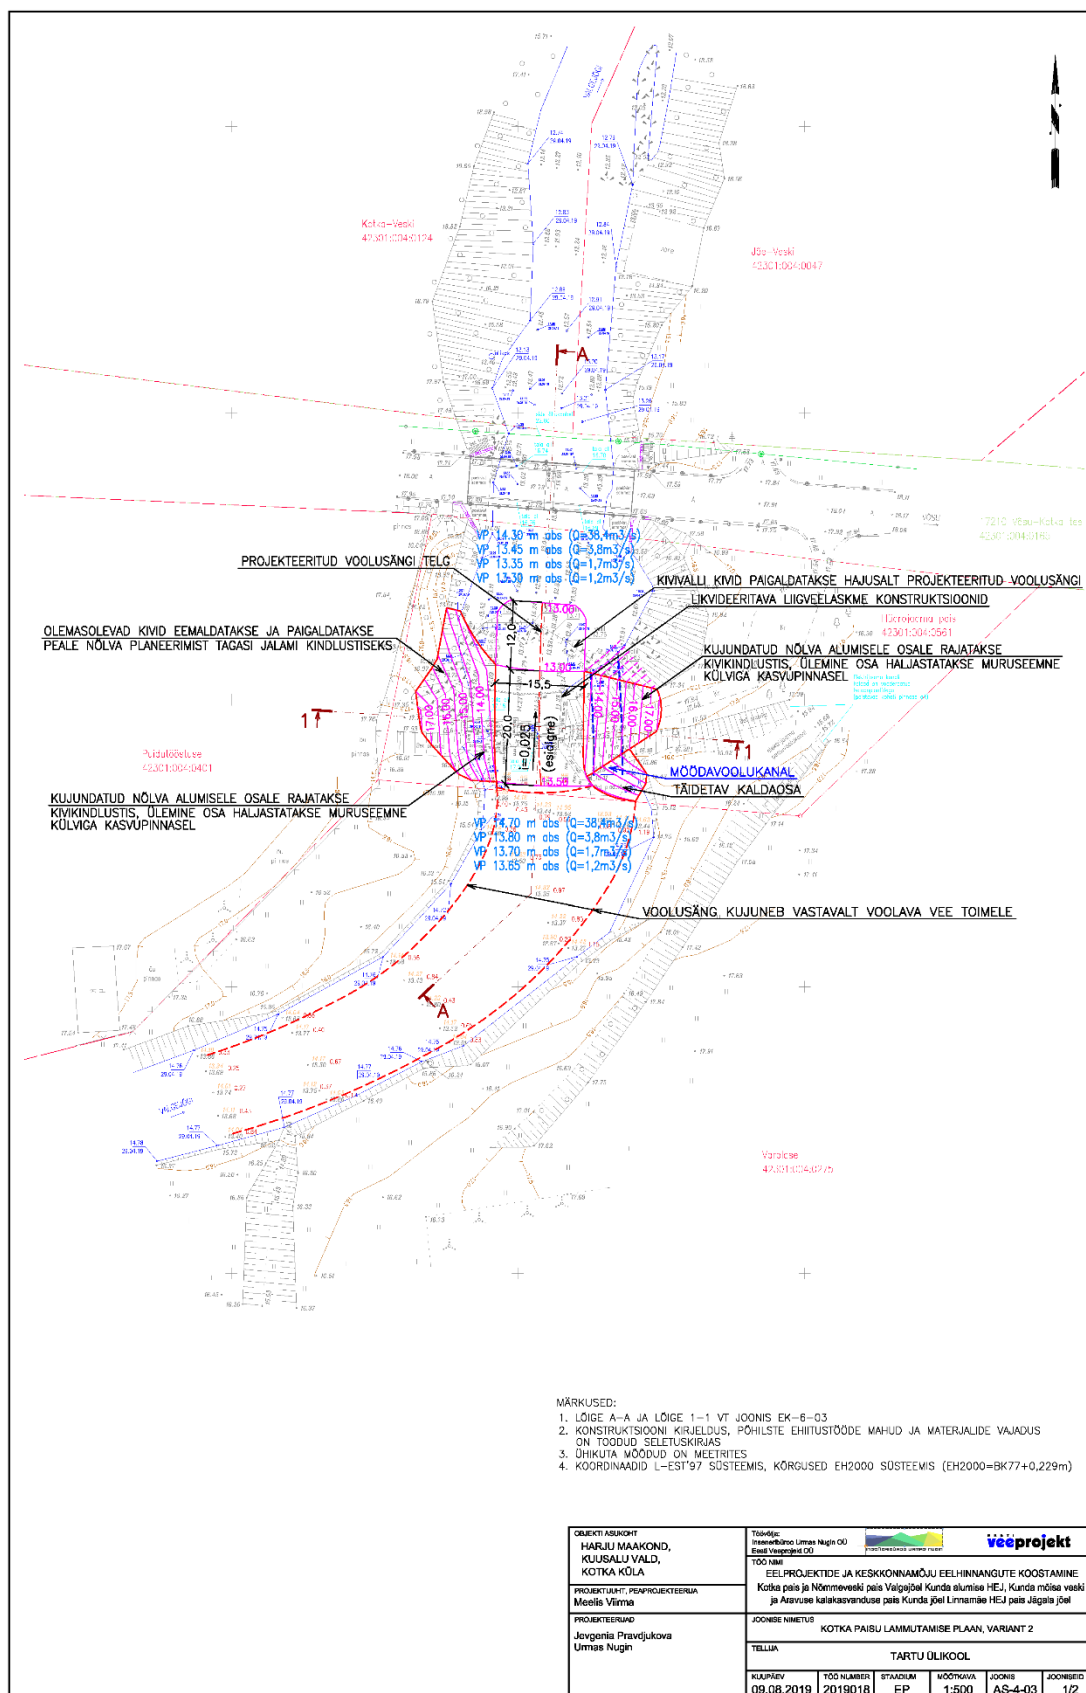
Design drawing (top view) of the second dam removal alternative for Kotka dam.
